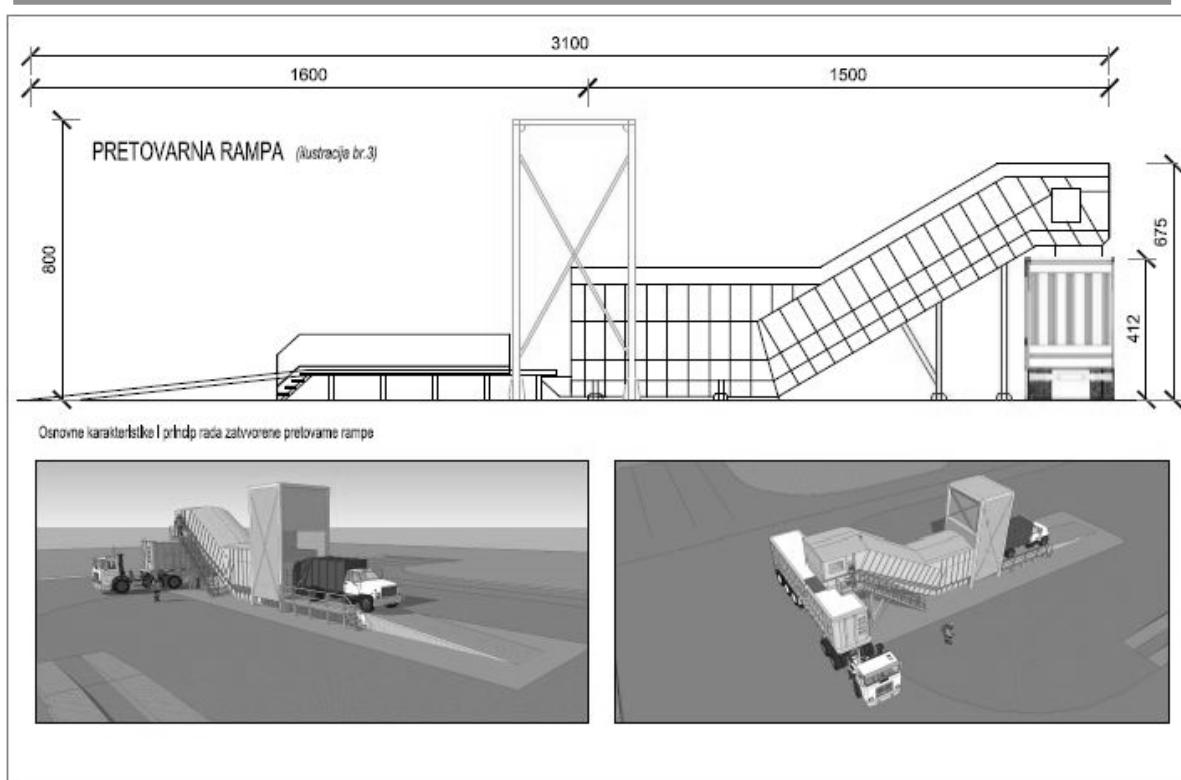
Typical view and cross section of belt conveyor and waste compacting containers
